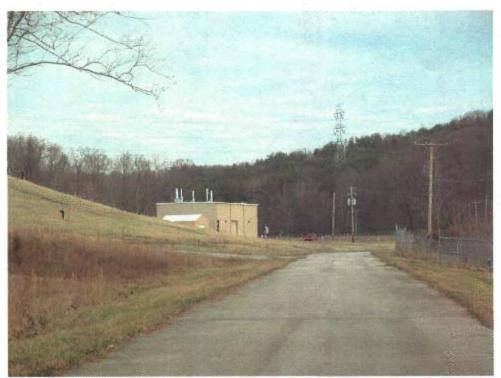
Inside Gate: looking toward leachate treatment facility; OU2 to left of structure, adjacent property and stream to right of photographer
